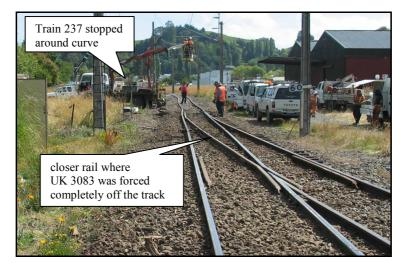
Infrastructure damage under repair at Hunterville, looking south
